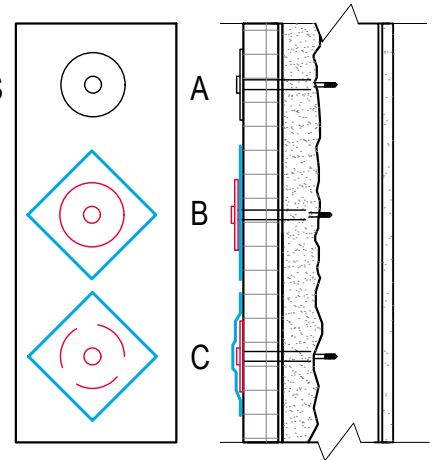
FASTENING FLASHING | ELEV. (L) & SECTION (R)
